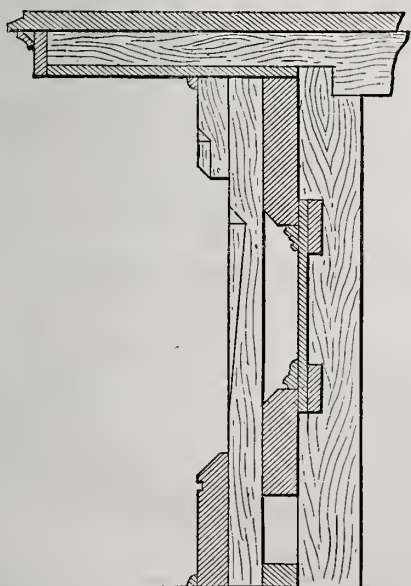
Section Through Counter.—Scale 1 Inch to the Foot.
